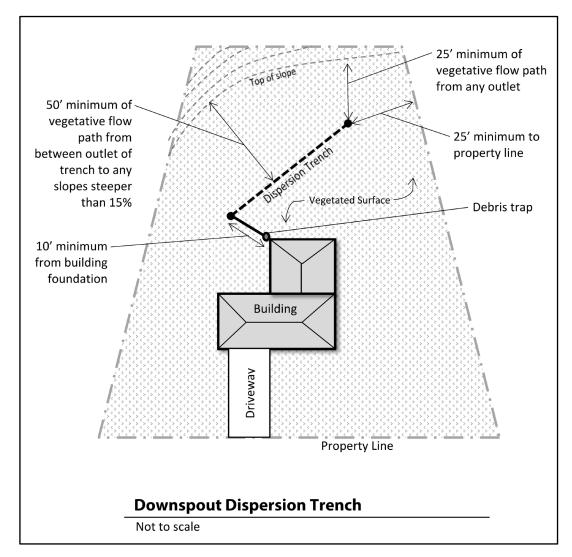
Typical Downspout Dispersion Trench Site Plan
